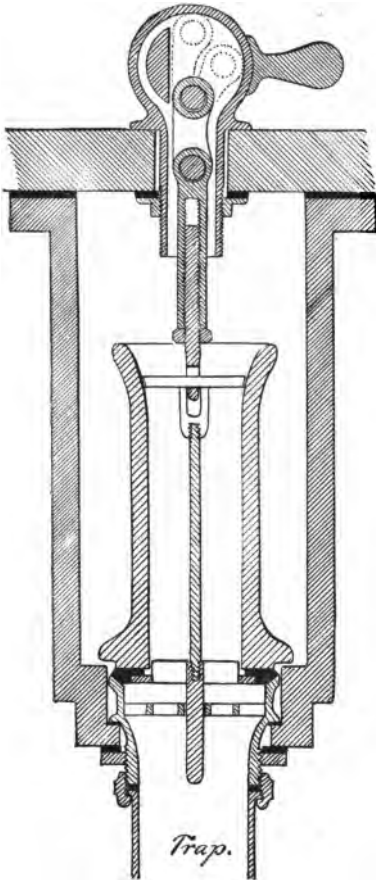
Detail of Lifting Mechanism. FIG. 48.—Perspective View of Lifting Mechanism.
